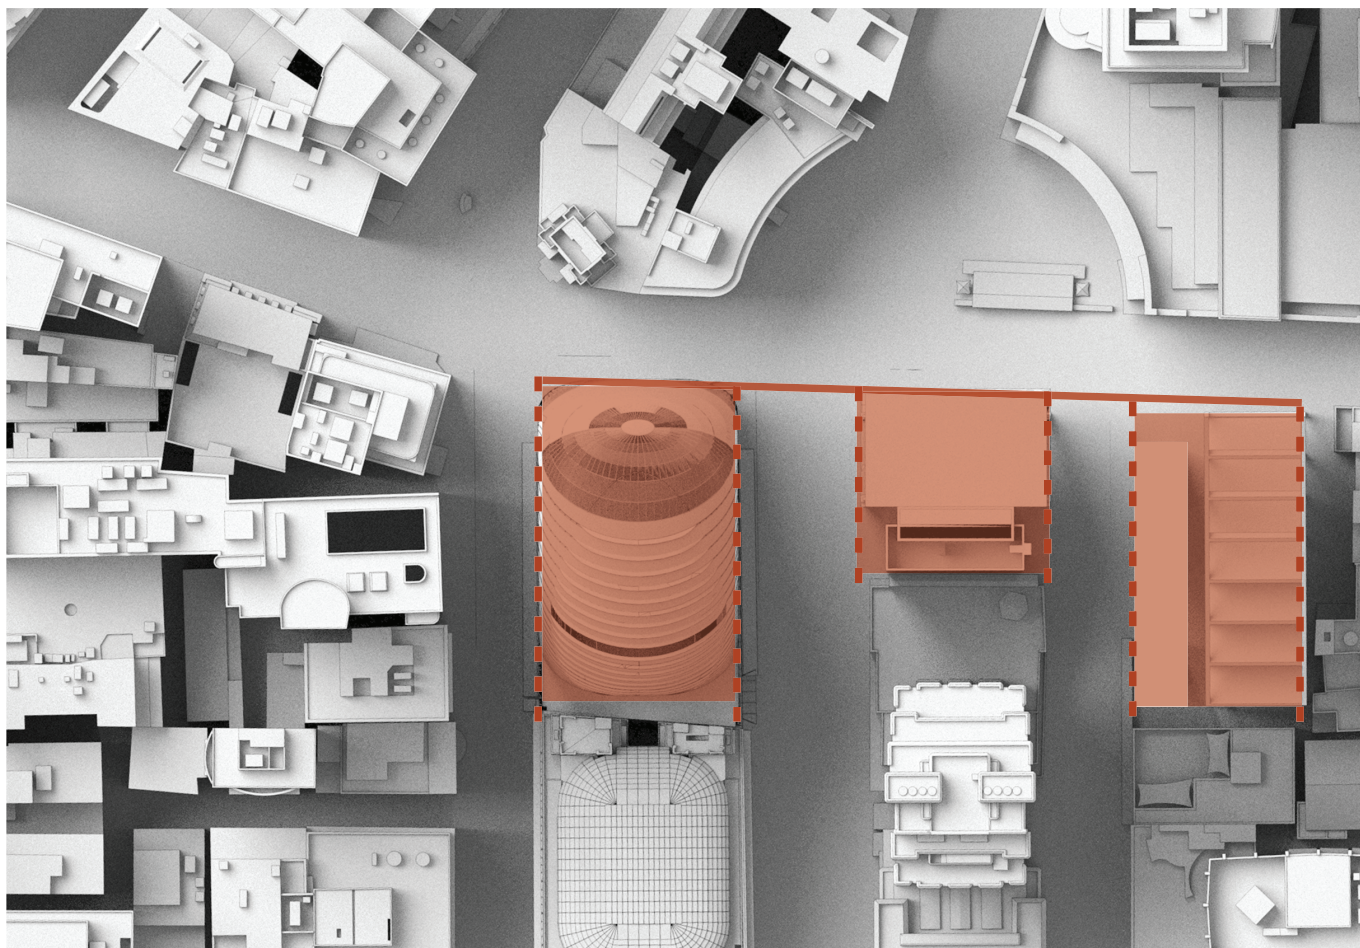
Hunter Street plan view - general alignment of neighbouring tower forms and street alignment
